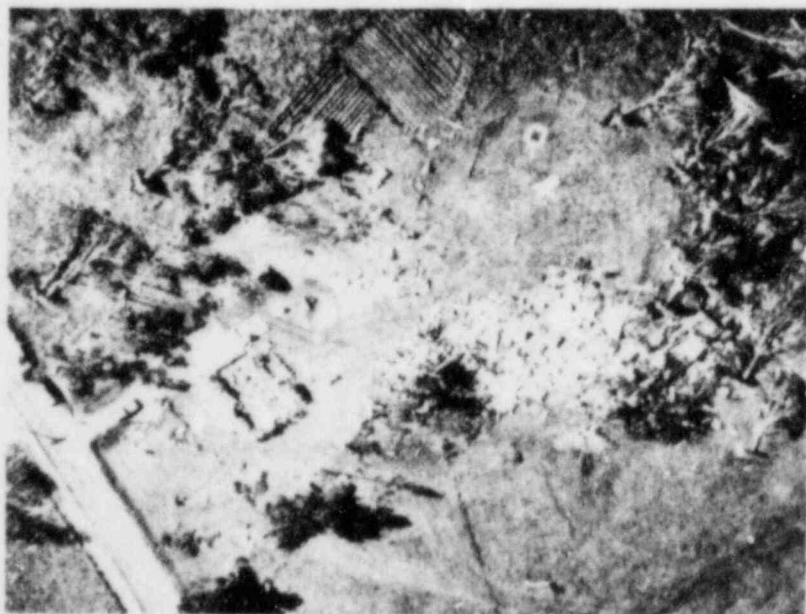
An aerial photograph of a destroyed house, with an empty foundation. The construction was probably too poor to consider the damage as an indication of F5 intensity.
